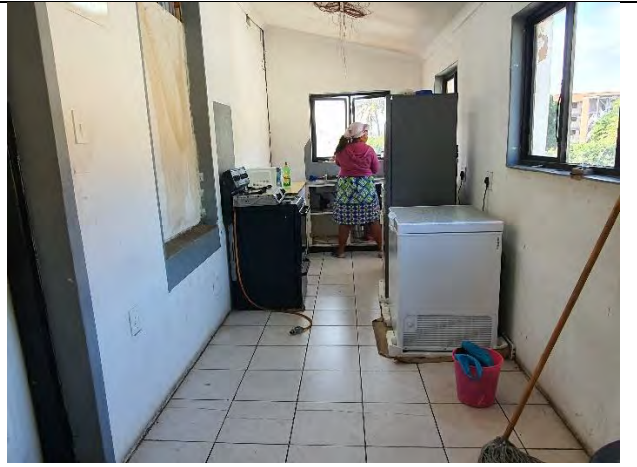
Verandha enclosed to create upper ground floor kitchen
